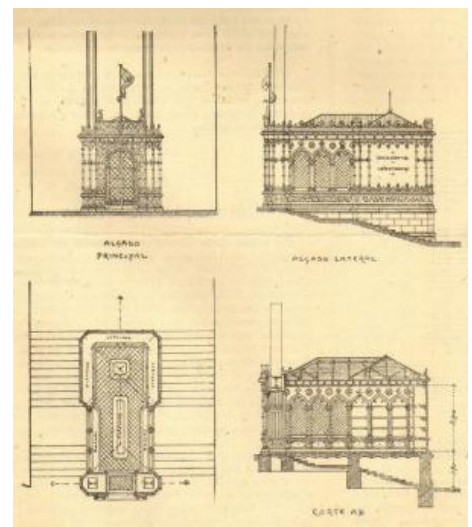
A. Marques da Silva, Design of a tourist pavilion in Gothic style to be build around a support pillar of the Elevator of Santa Justa. (In *A Construção Moderna e as Artes do Metal*, 12: 367, 5 April 1912)
